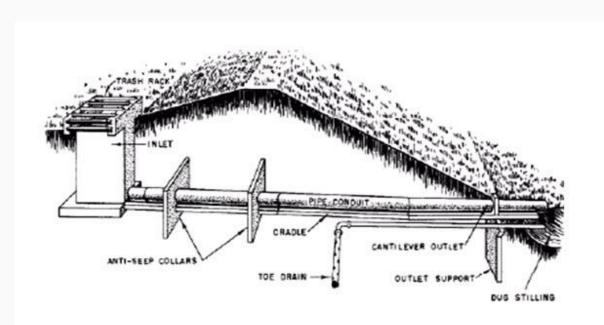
Drop inlet spillway. (Source: SCS, 1984)
